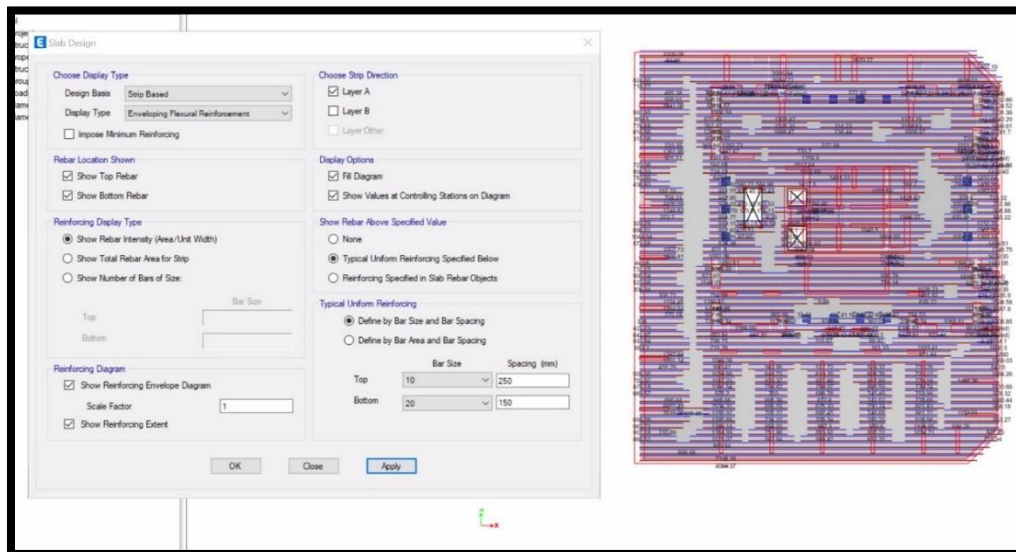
Bottom Reinforcement in X-Direction for Ground Floor
